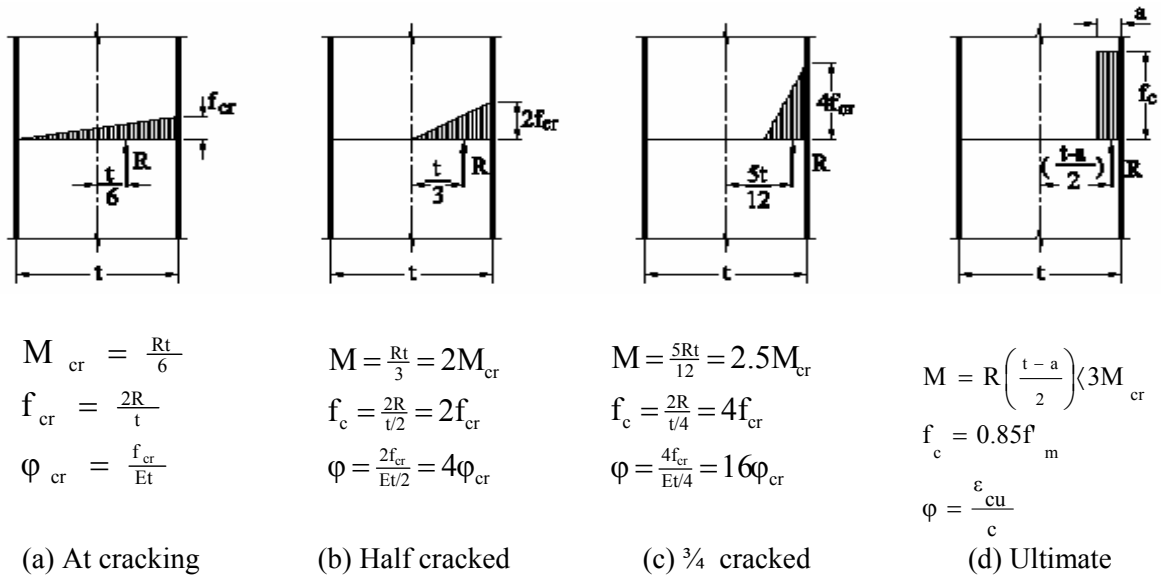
Moments and curvatures at center of face-loaded wall (Paulay and Priestley, 1992)
